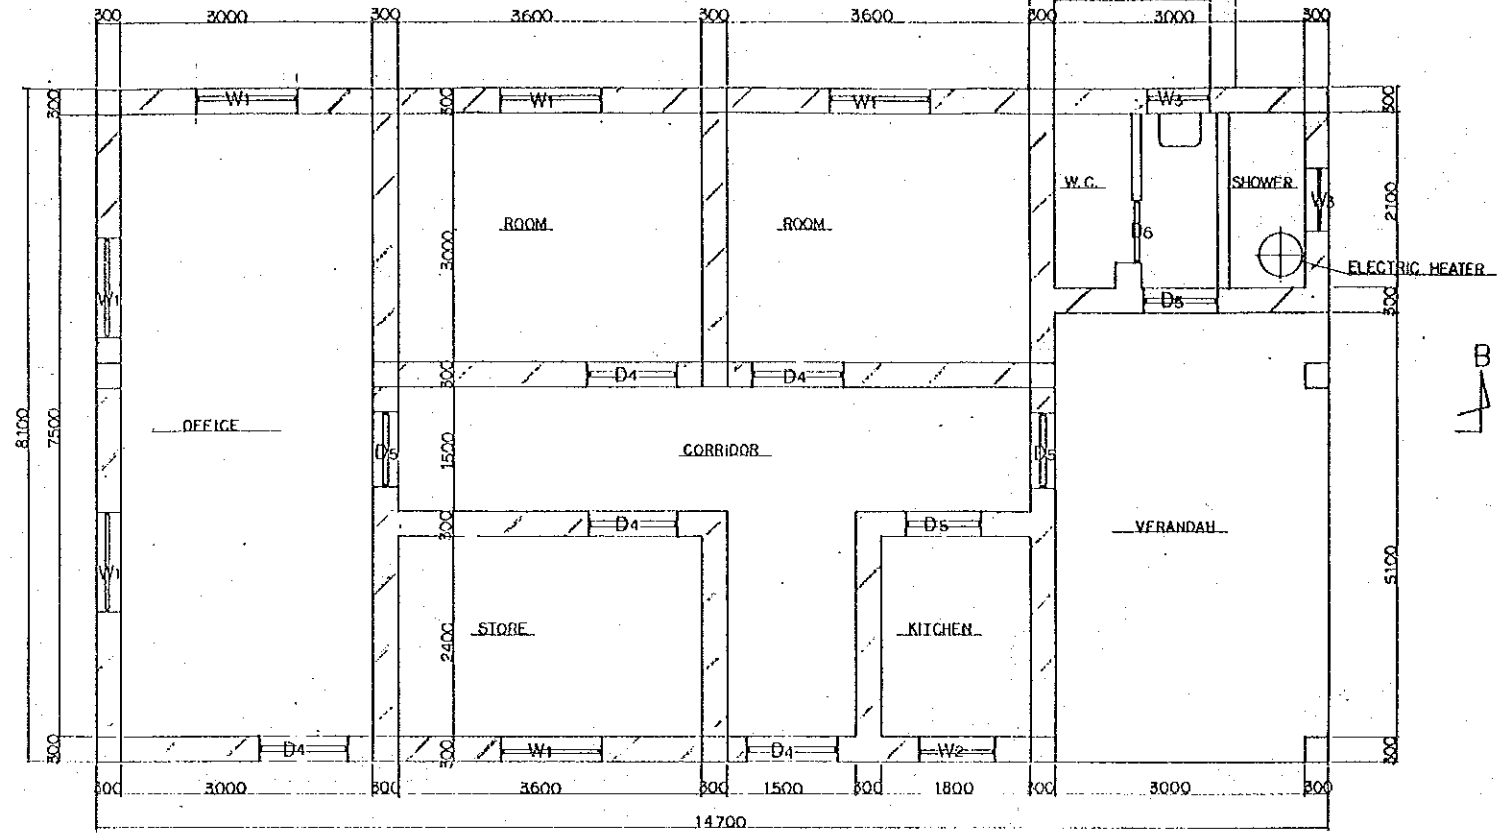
GENERAL LAYOUT OF WELL PUMP STATION
